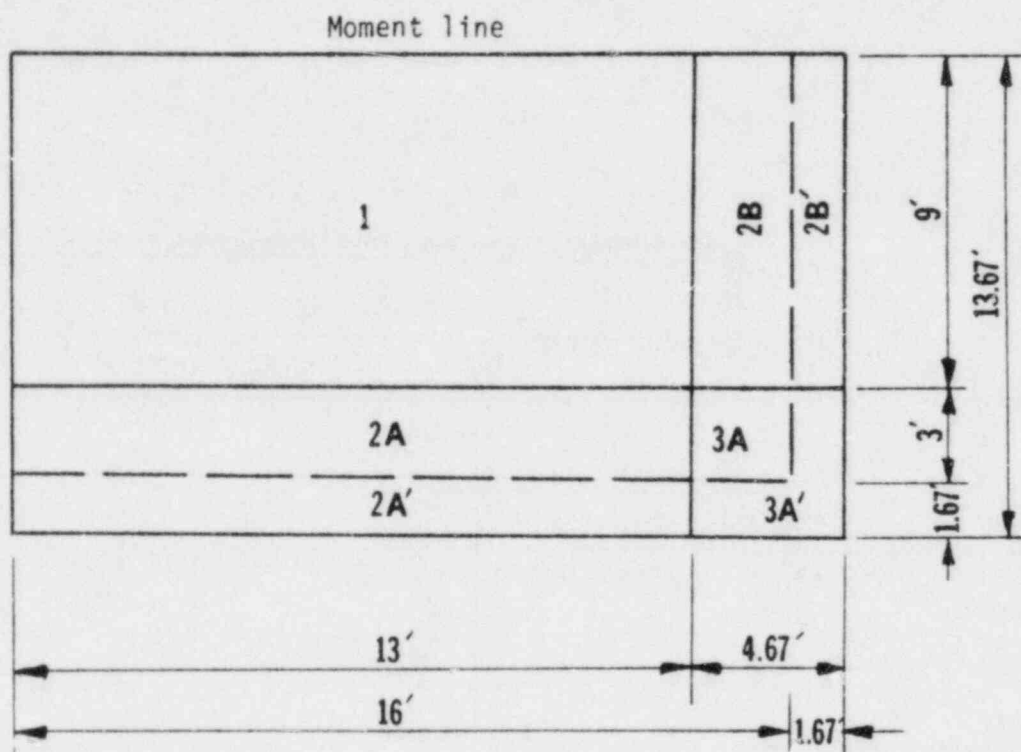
Plan view of the failed roof section of the Recreation Building as divided into ANSI-A58.1 1982 wind regimes.
